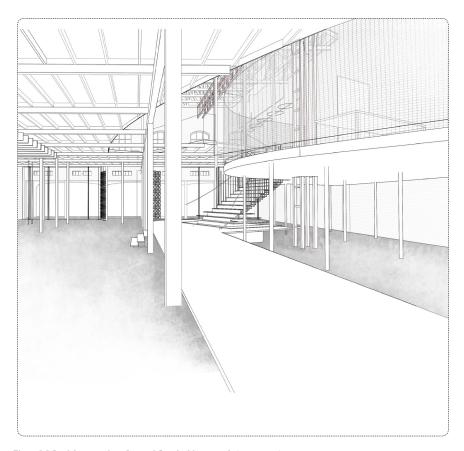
Spatial perspective of ground floor looking towards (Author 2013)
